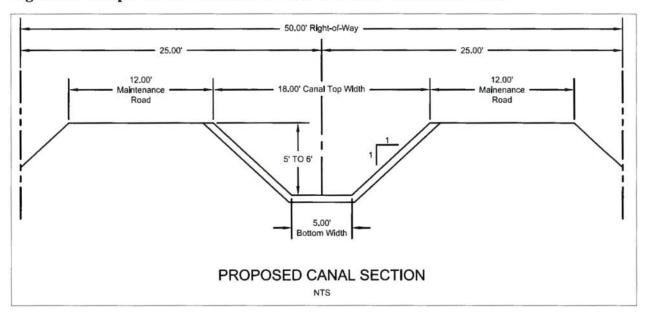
Proposed Channel Cross-Section at the La Union East Canal
